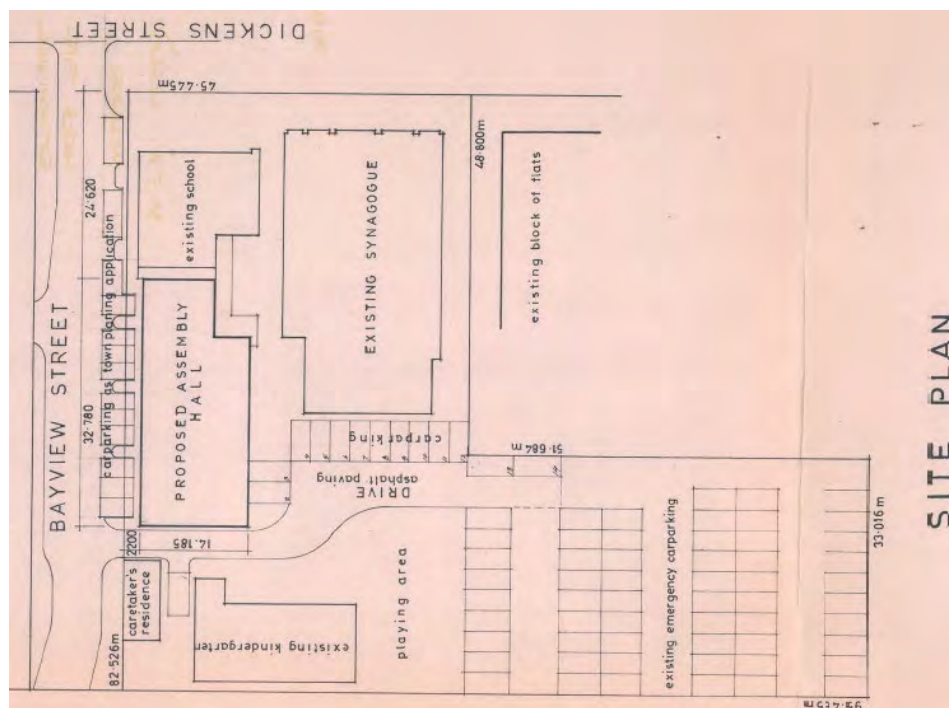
Drawing related to building permit 7845. Site plan (Nicholas Katris & Assoc. June 1979) (Source: Council Building File)
